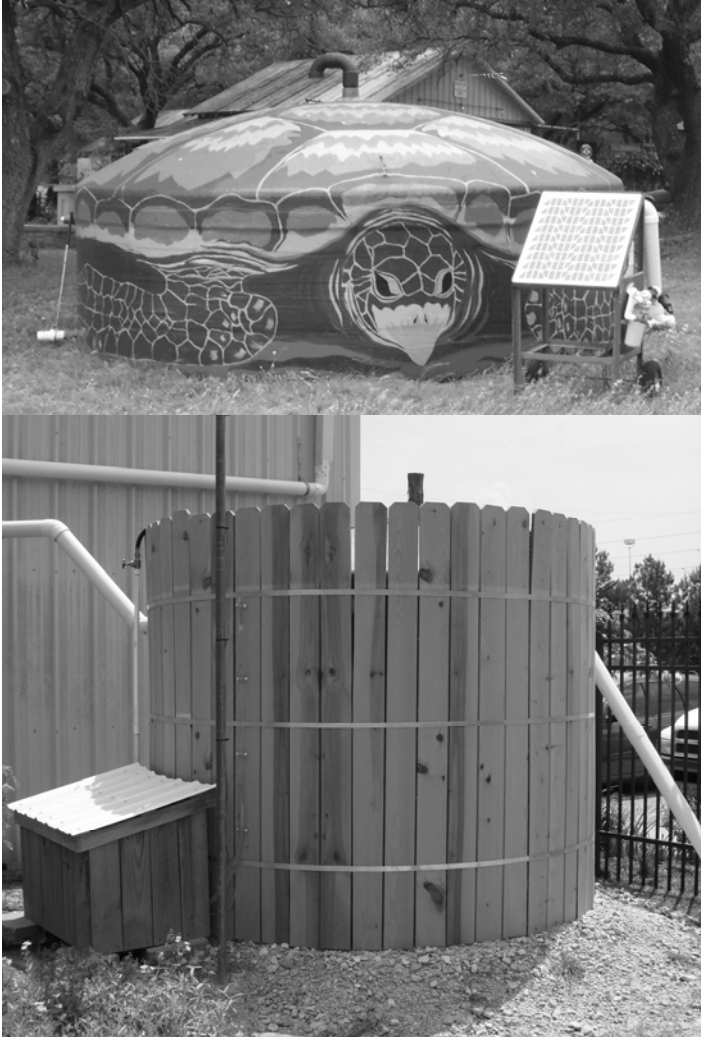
Storage tanks can be painted or wrapped in wooden planks to make them more aesthetically pleasing.
